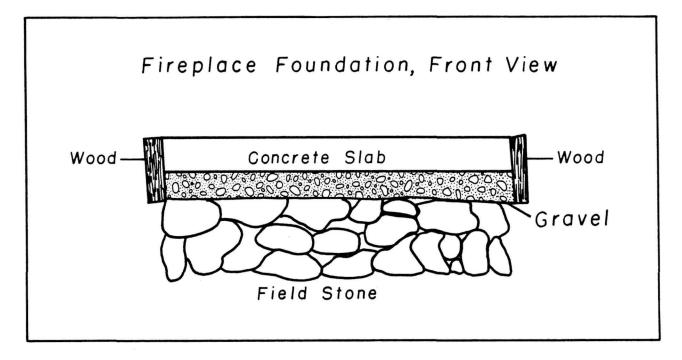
Suggested structural profile to prevent frost from cracking foundation (taken from Brann 1976:133).
